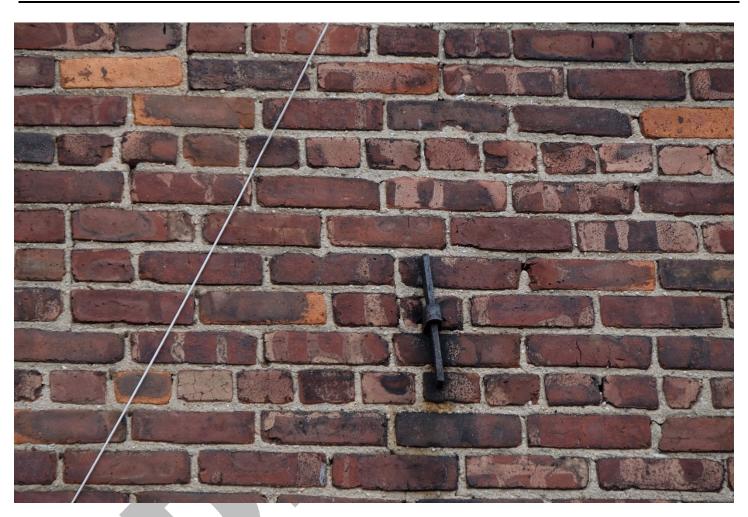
Detailed view of the brickwork at the south side wall of the 1923 addition showing an iron tie and the 5 course American bond.
